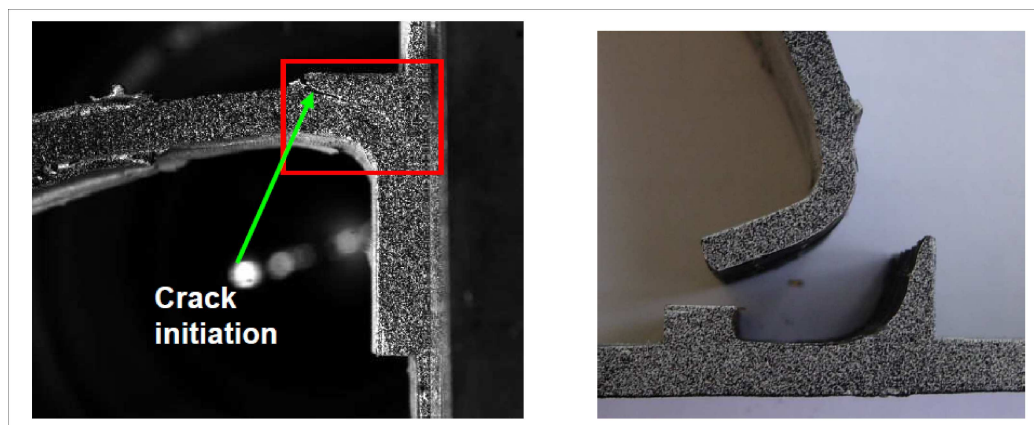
Failure initiation and final failure pattern for 15 mm pinned L-joint under bending.
